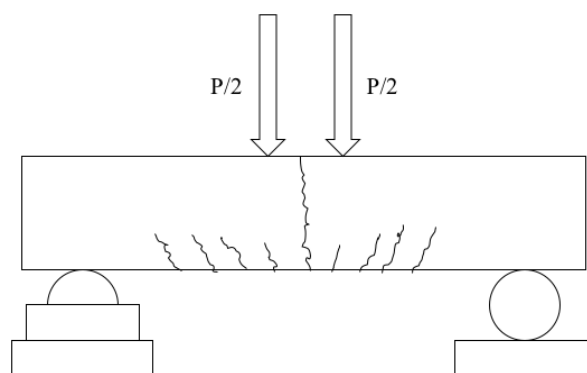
Bend moment failure of a reinforced concrete beam under applied load, redrawn based on [42].
